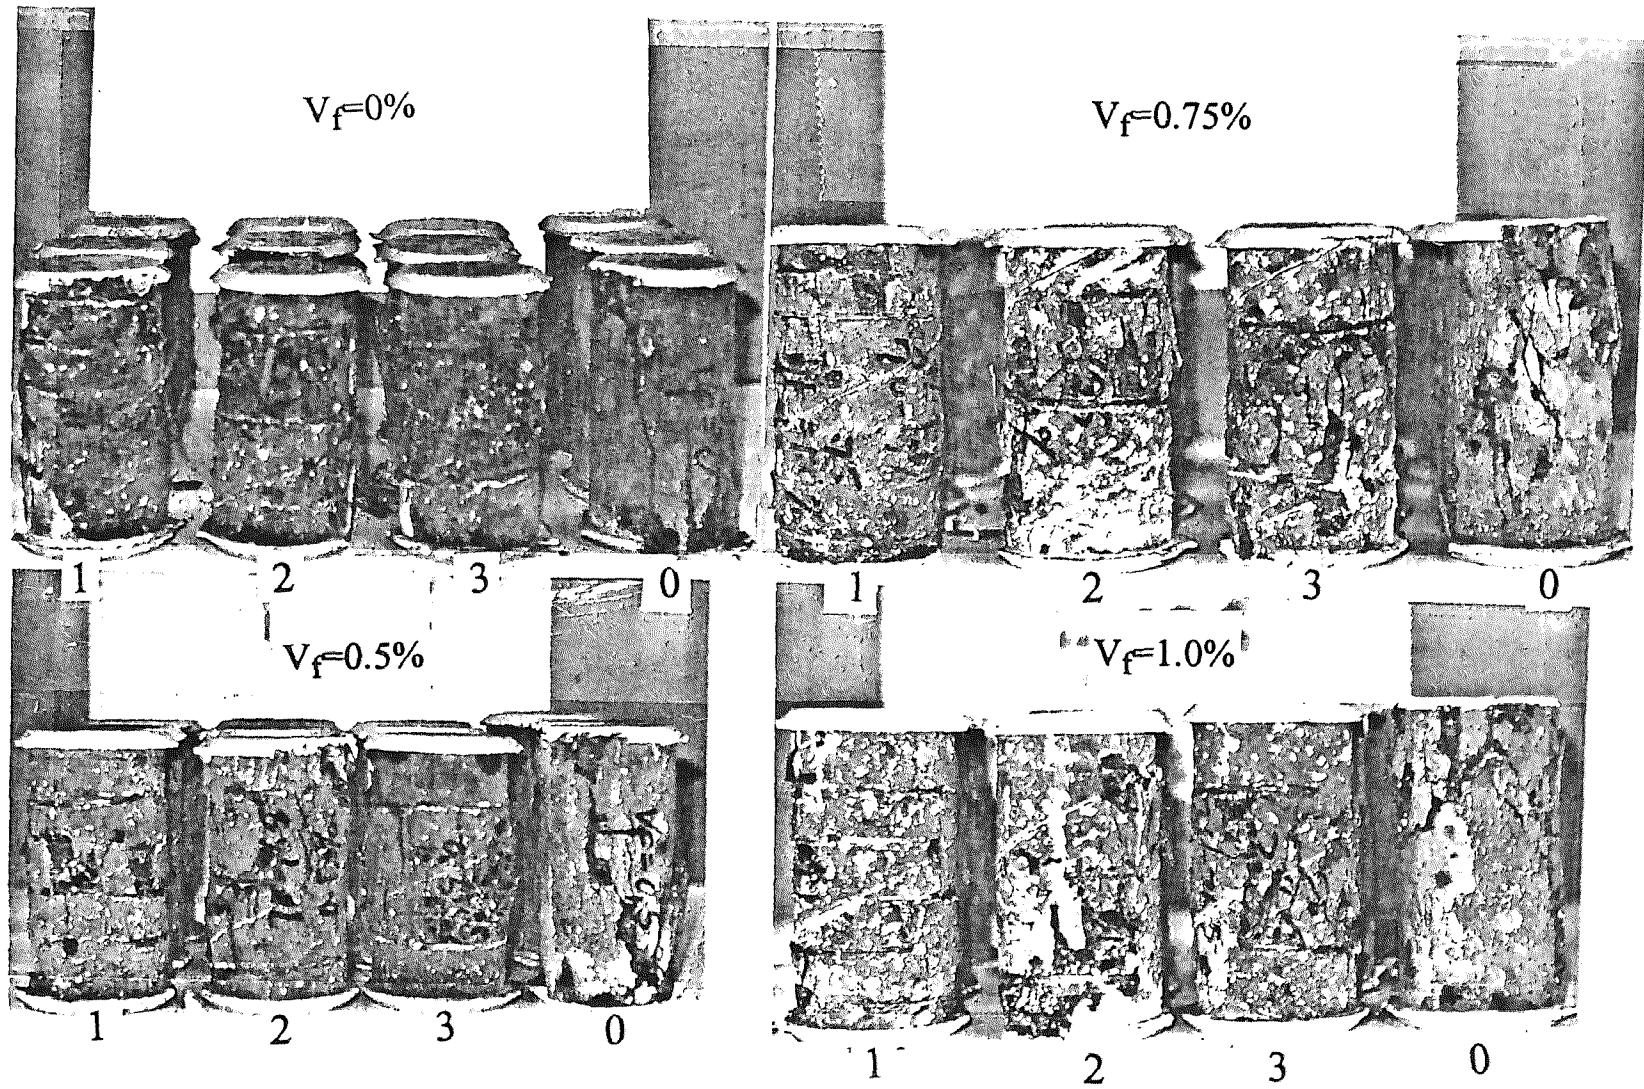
Some of the Cylindrical Specimens after Testing.
